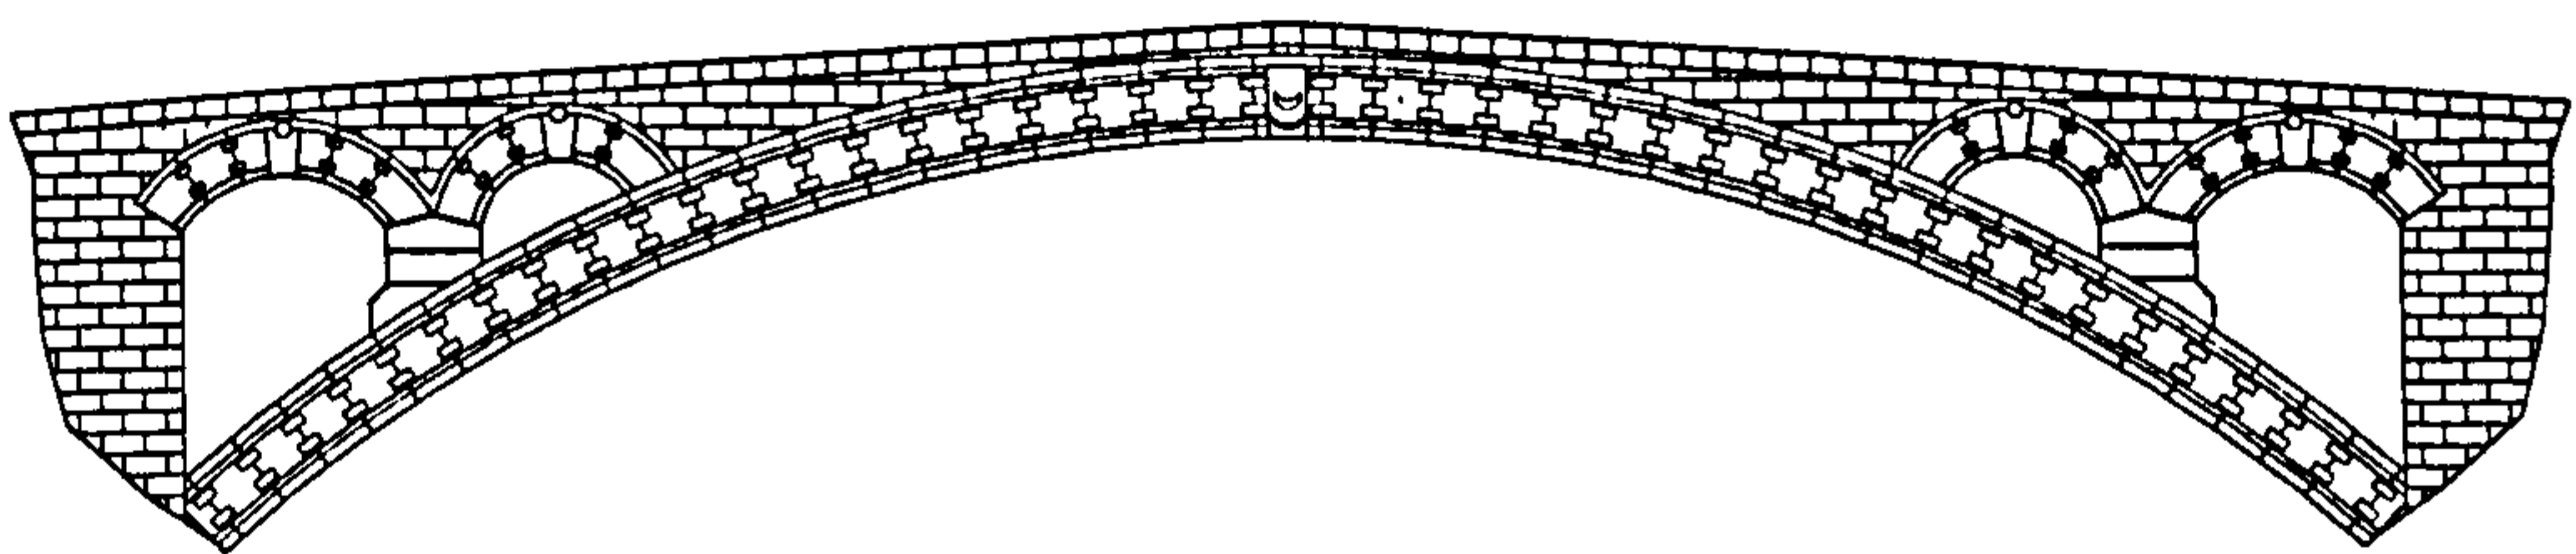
Zhao Zhou Bridge* (Li, 595-606 AD)
